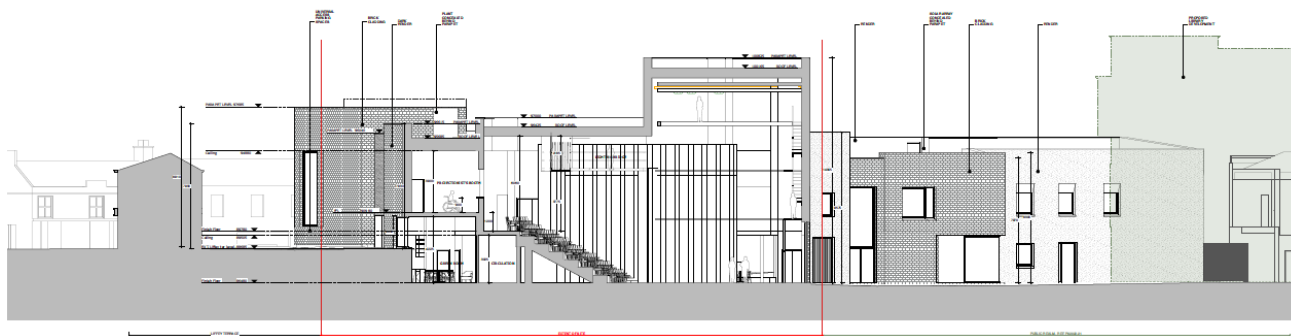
Proposed Cross-Section (Source: Studio Red Architects)
